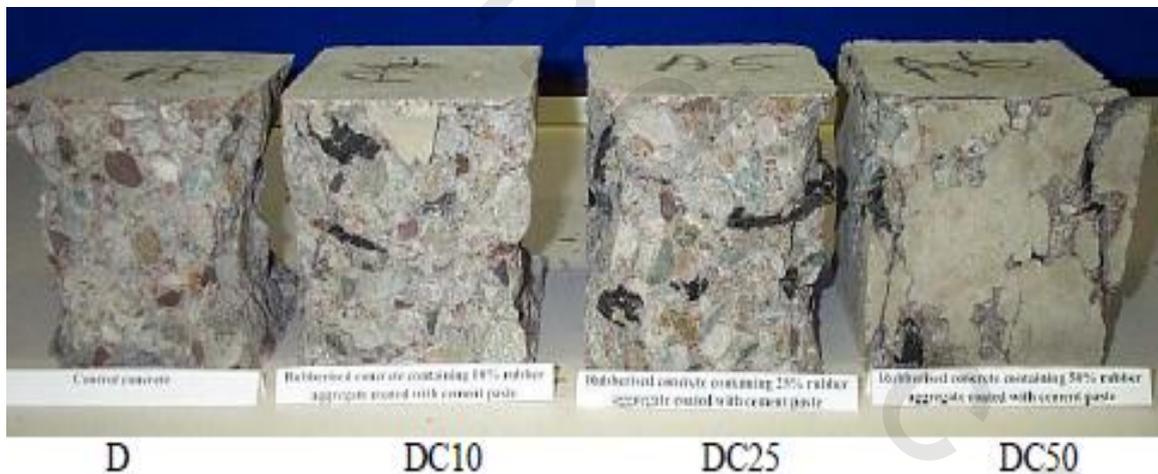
Compressive strength test samples of the rubberized concrete containing rubber particles coated with cement paste
